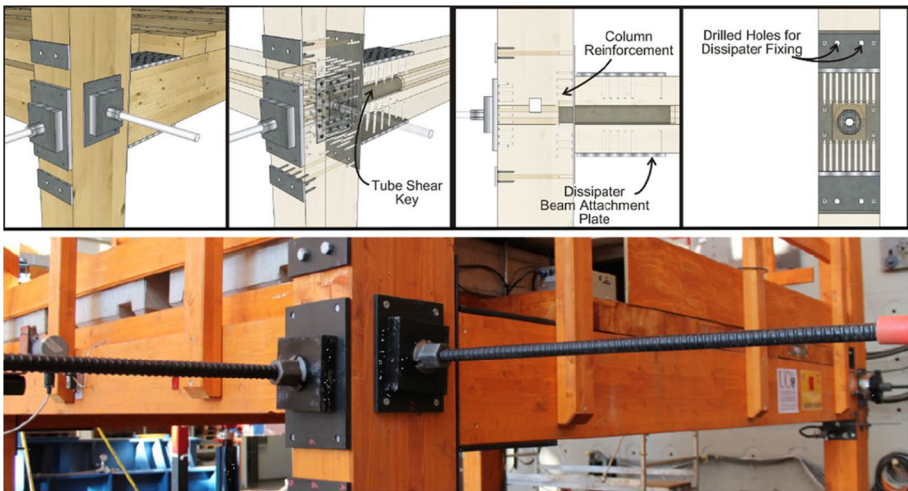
Details of beam-column connection of post-tensioned timber frame building with passive energy dissipation systems (Cesare et al. 2017)
